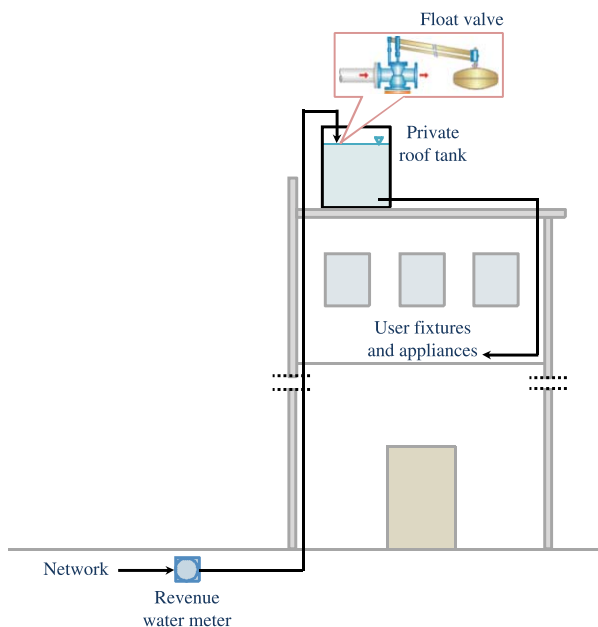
| A schematic of a typical plumbing connection to a private roof tank.
